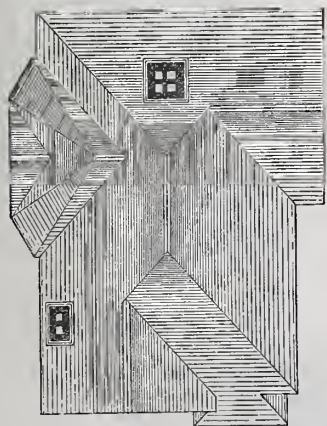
Roof Plan.—Scale, $\frac{1}{16}$ Inch to the Foot.
